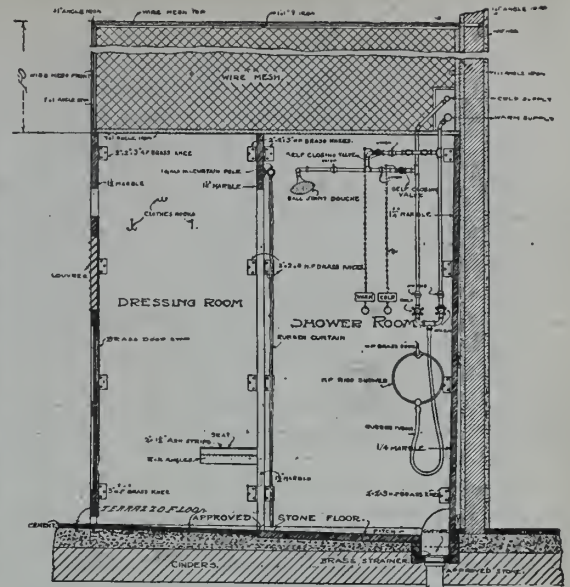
and 5 show the plan and details of a typical shower bath as at present installed in the New York schools, while Figs. 6, 7 and 8 are a plan and sections of double showers. Mixing chambers are provided, one for each tier of baths, which are connected with the main hot and cold water supply pipes with branches of the necessary size and provided with gate, loose key and check valves, and unions on the branch supplies. The mixing chambers are arranged with automatic devices, thermometers, etc., so that the water delivered at the showers will have a temperature averaging from 80 to 85 degrees Fahrenheit. The delivery pipes from the mixing chambers to the shower are extended to each tier of baths independently, with the branches for showers and connections made at the chambers with brass gate valves and unions. Connections are also made with the main cold-water supply line and a branch extended for each tier of baths with a gate valve on each line. These
